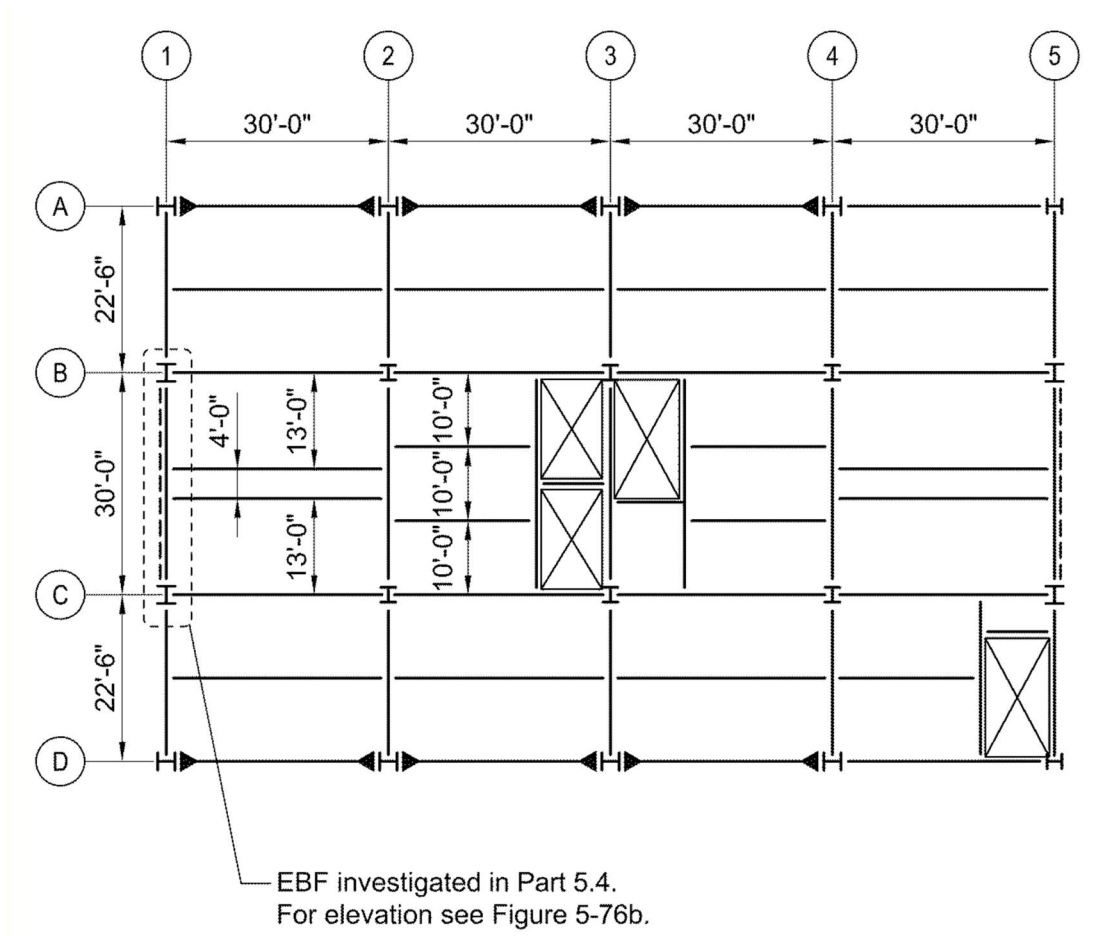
Floor plan for steel building highlighting considered EBF (AISC 341, 2016)
